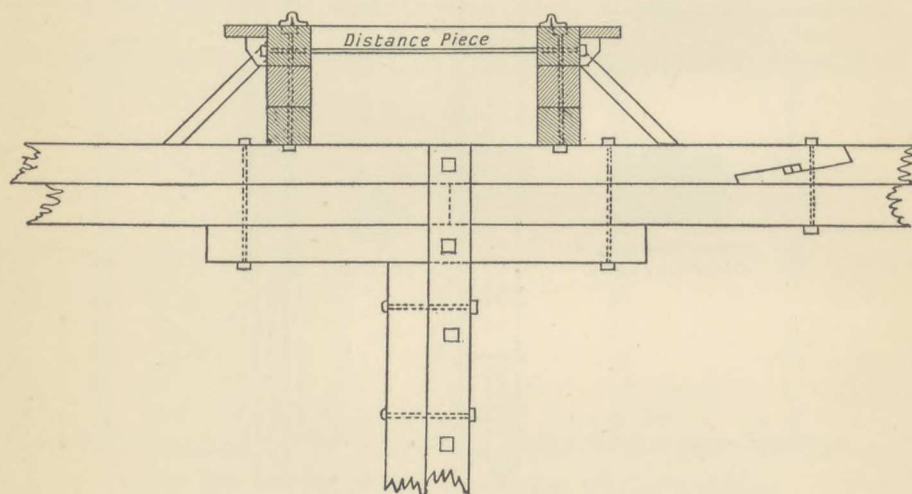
Rail Track, Holyhead Breakwater Staging.
